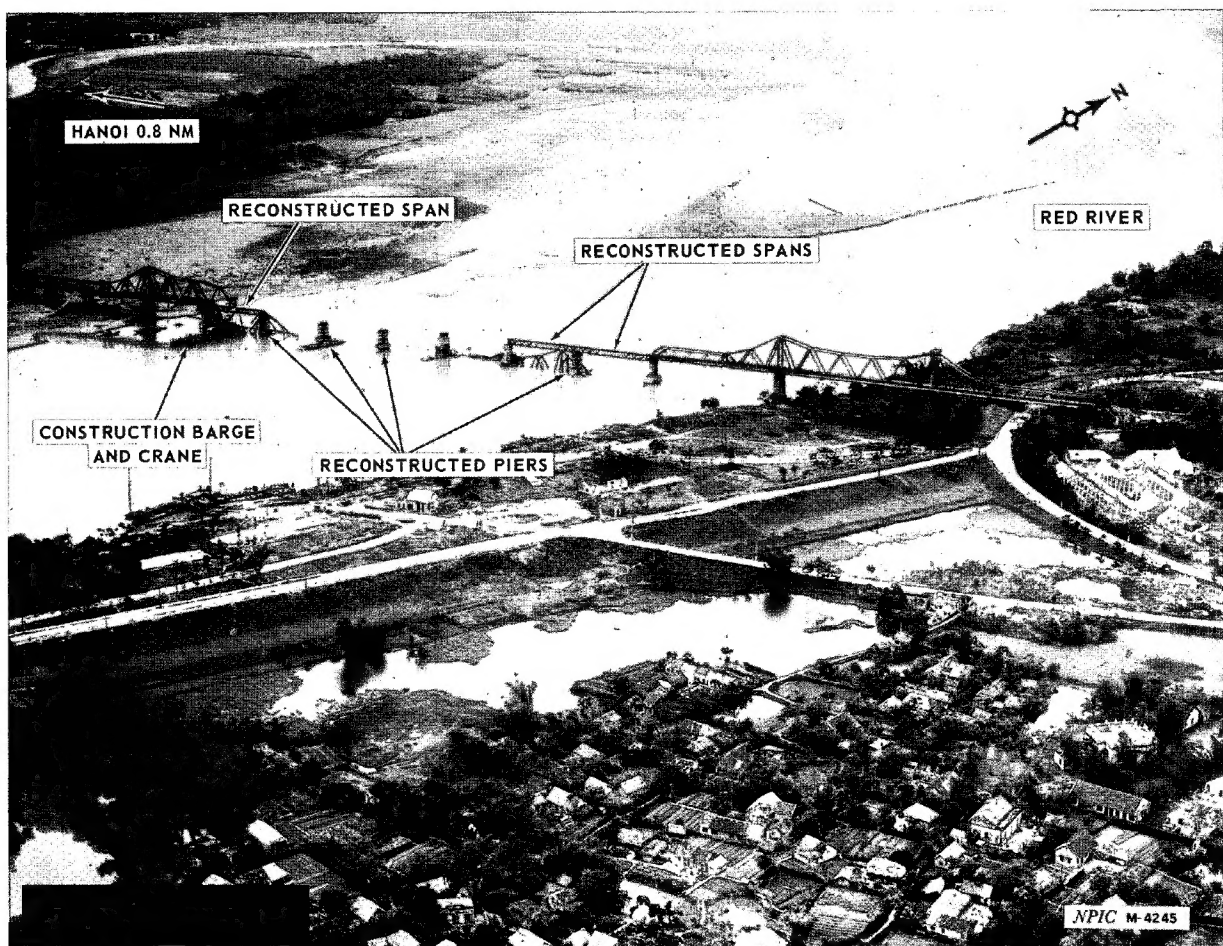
PAUL DOUMER RAIL/HIGHWAY BRIDGE.
